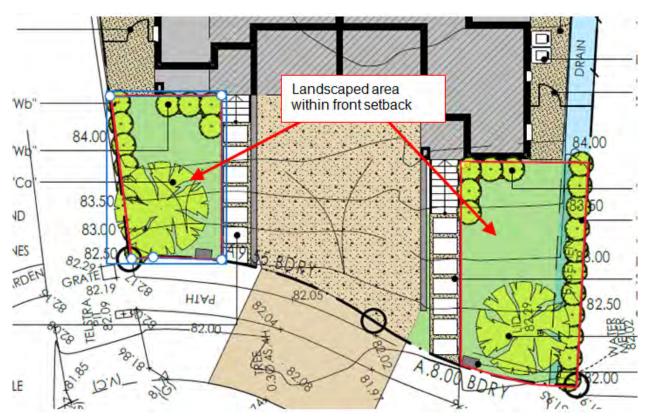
Extract from landscape plan showing extent of hard paving within front setback
